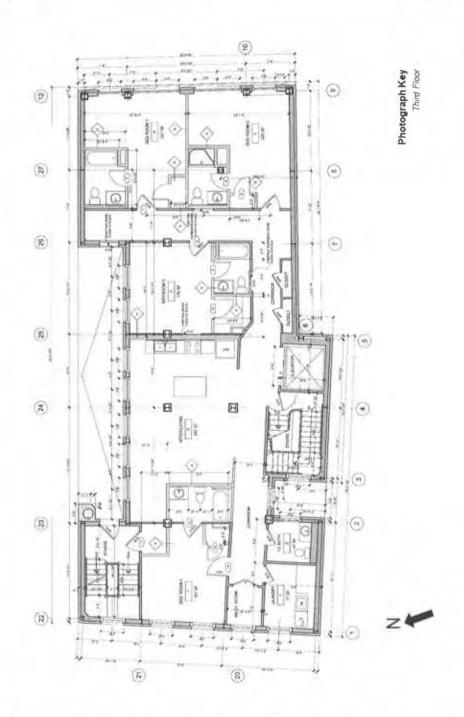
Third-floor plan (2016). Reproduced by permission from the current owner, Wallachia LLC.
